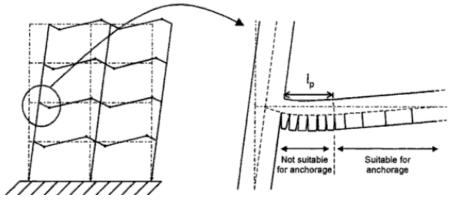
Member cracking, assuming a strong column, weak girder design
